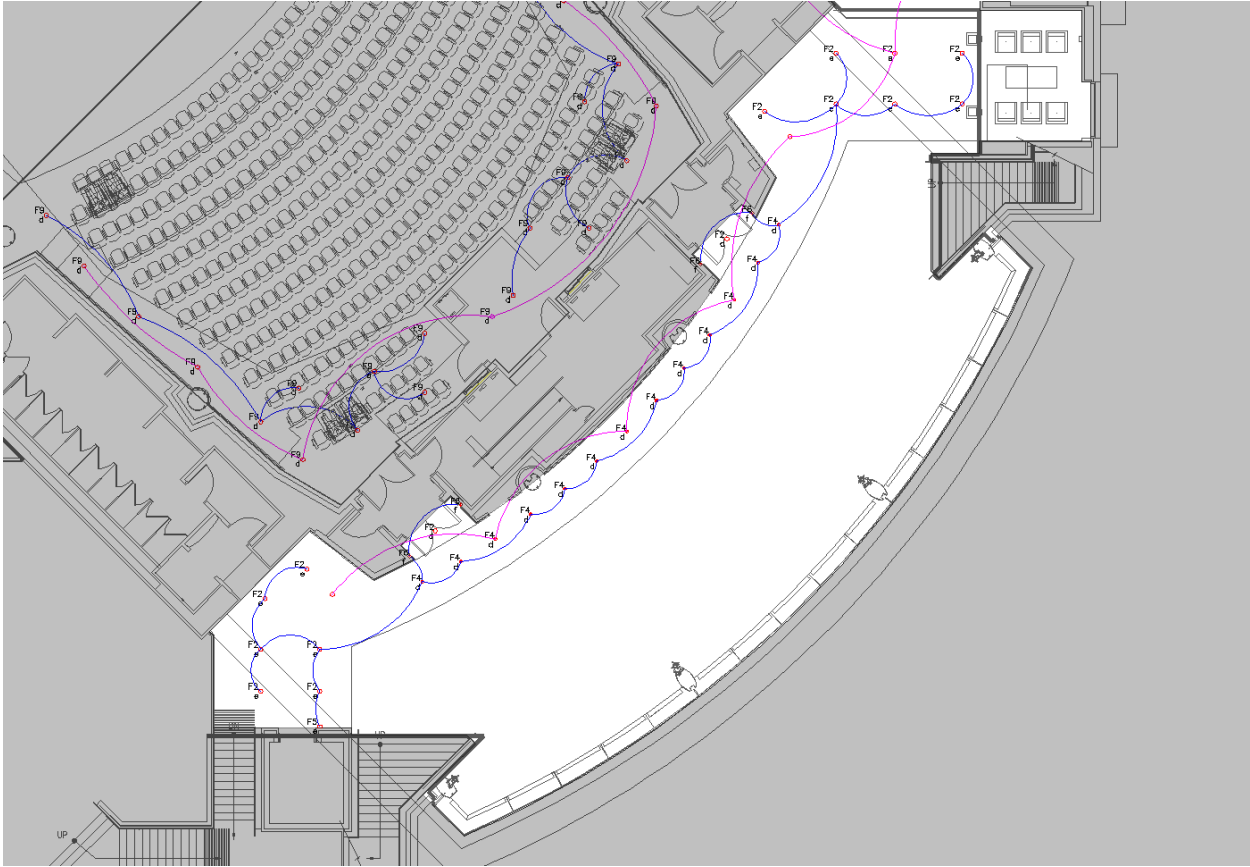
Main Lobby – Balcony Level North Lighting Plan
